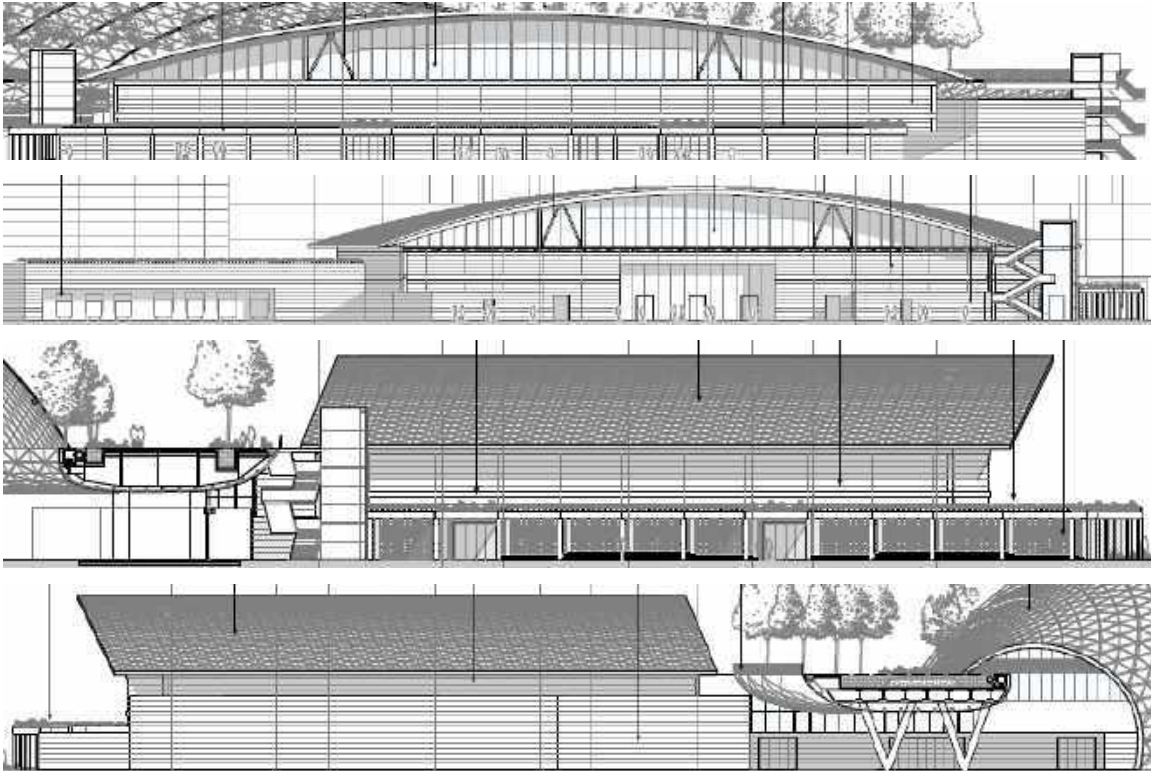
Illustration of the event building façades. Top to bottom: the southeast, northwest, northeast, and southwest facades.
